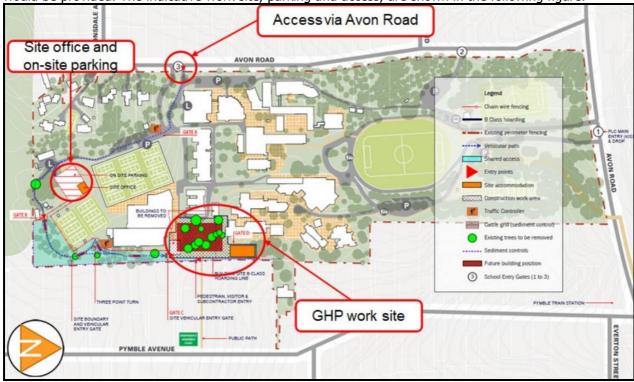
Indicative Work Site, Parking and Access (Stantec 2021)
